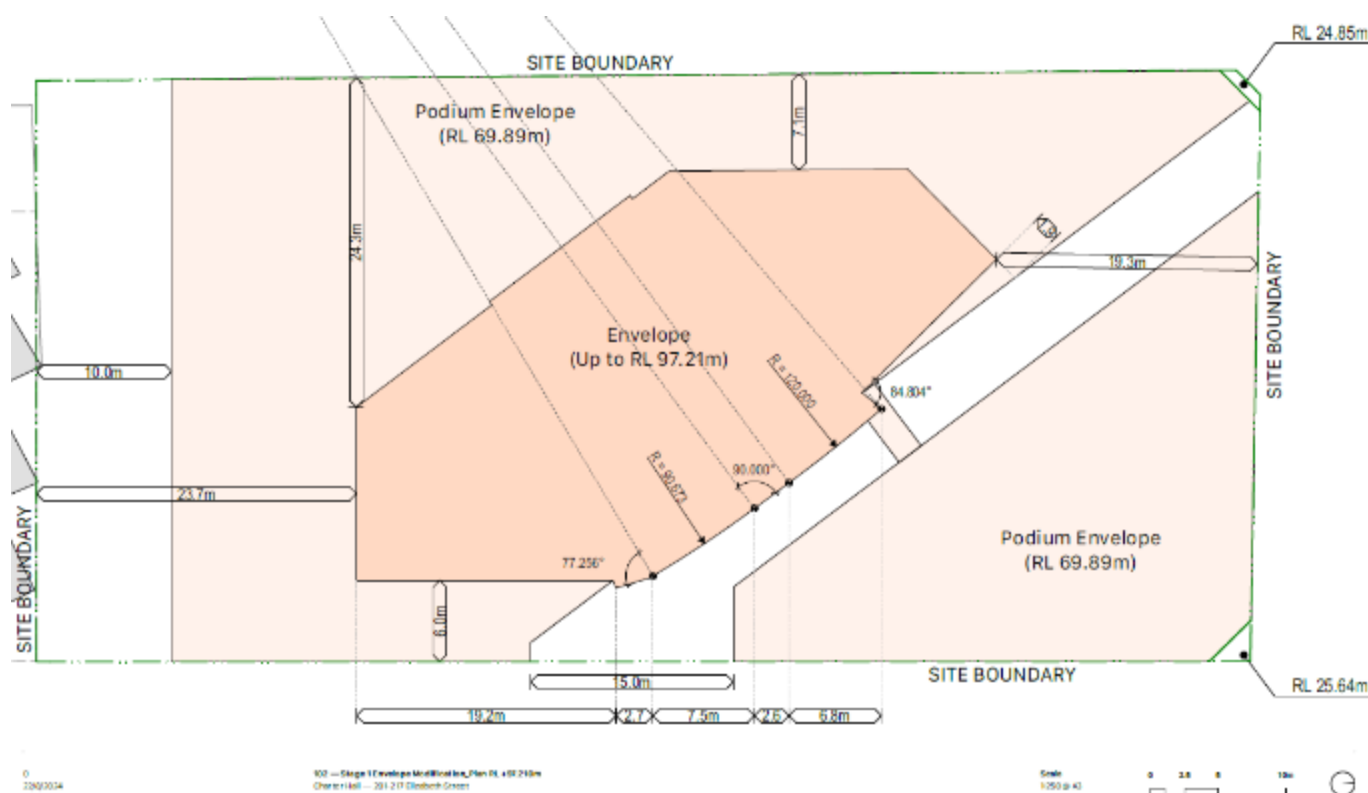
| Proposed low-rise tower (up to RL 97.210) (Source: Ethos Urban modification plans)
